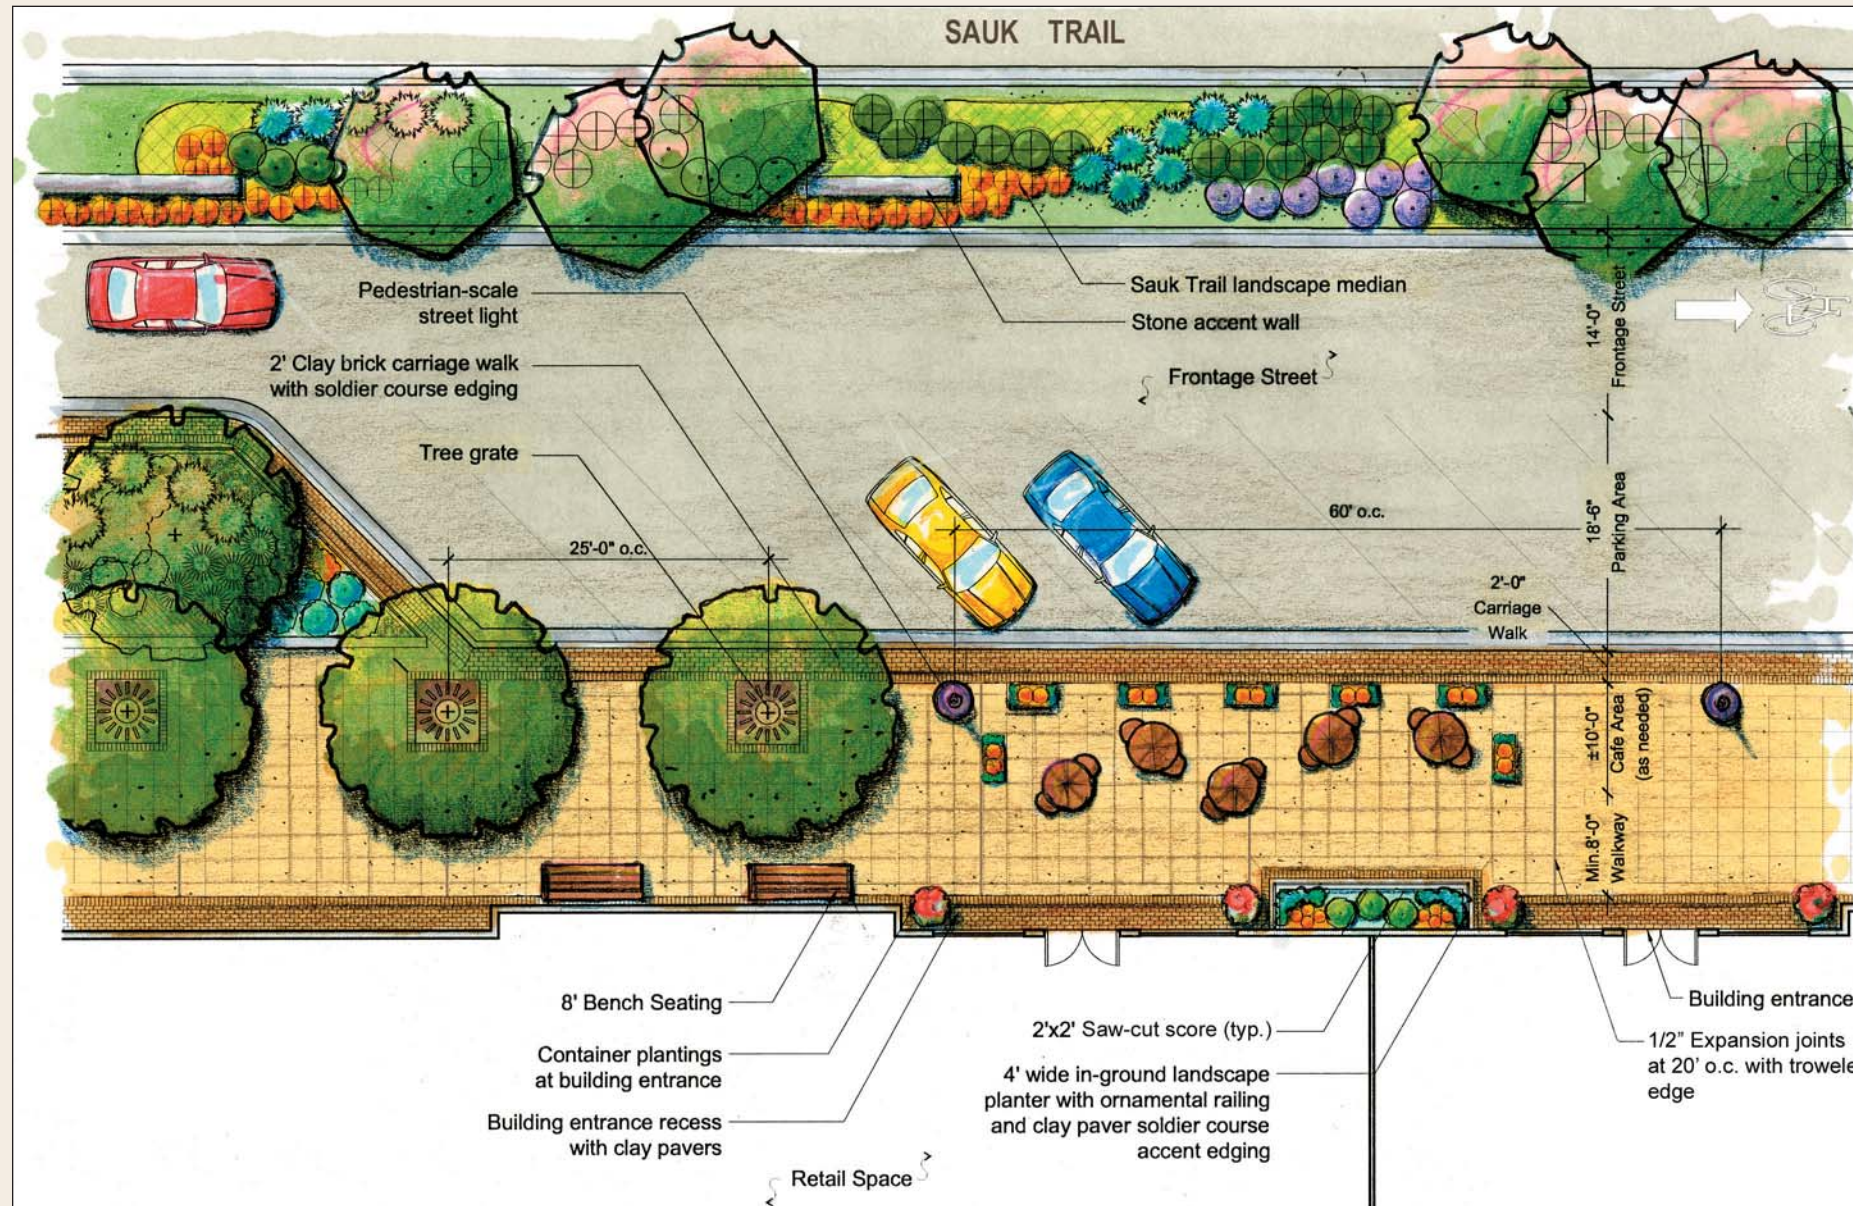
Core Area Detail Plan illustrates streetscape materials and their locations.
